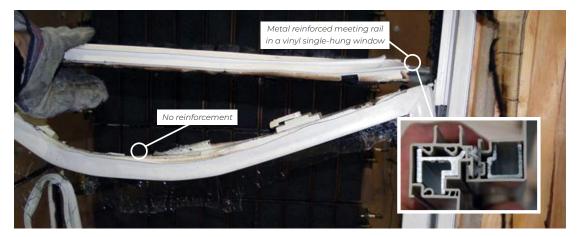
Damage caused by radiant heat on two vinyl window frames, one with no metal reinforcement where the frame failed, and one with metal reinforcement where the frame did not fail.
